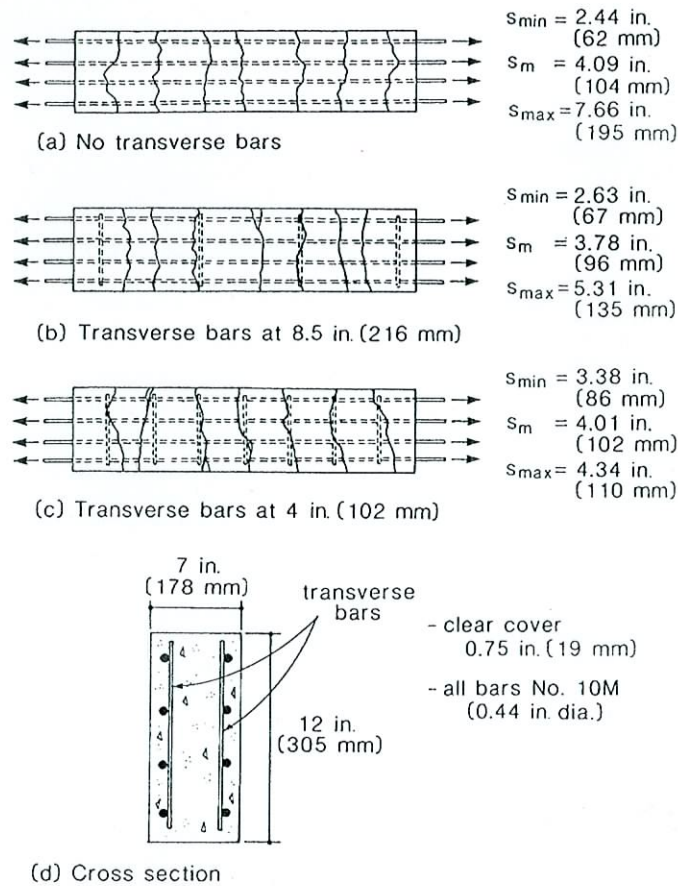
Influence of transverse bars on crack spacings. Adapted from Rizkalla, Hwang, and El Shahawi (Ref. 4-14).
